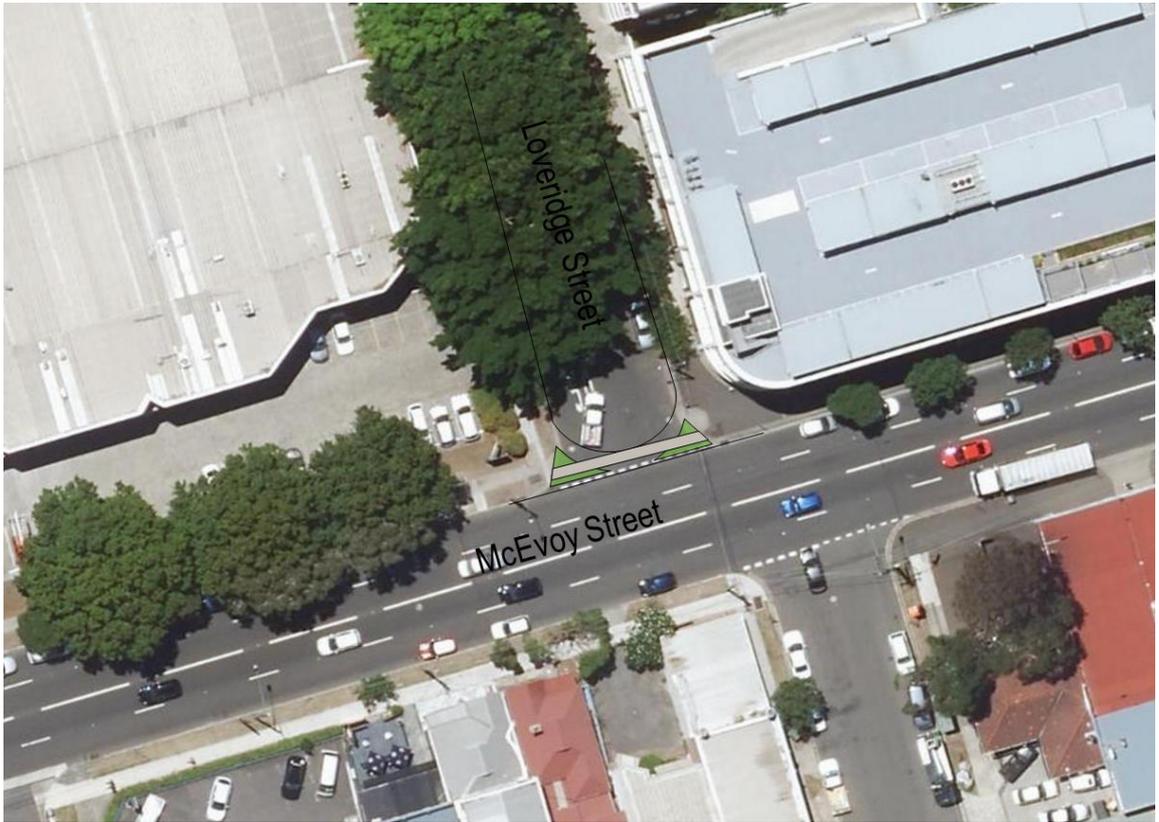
Proposed LATM Measures – Lovridge Street closure
